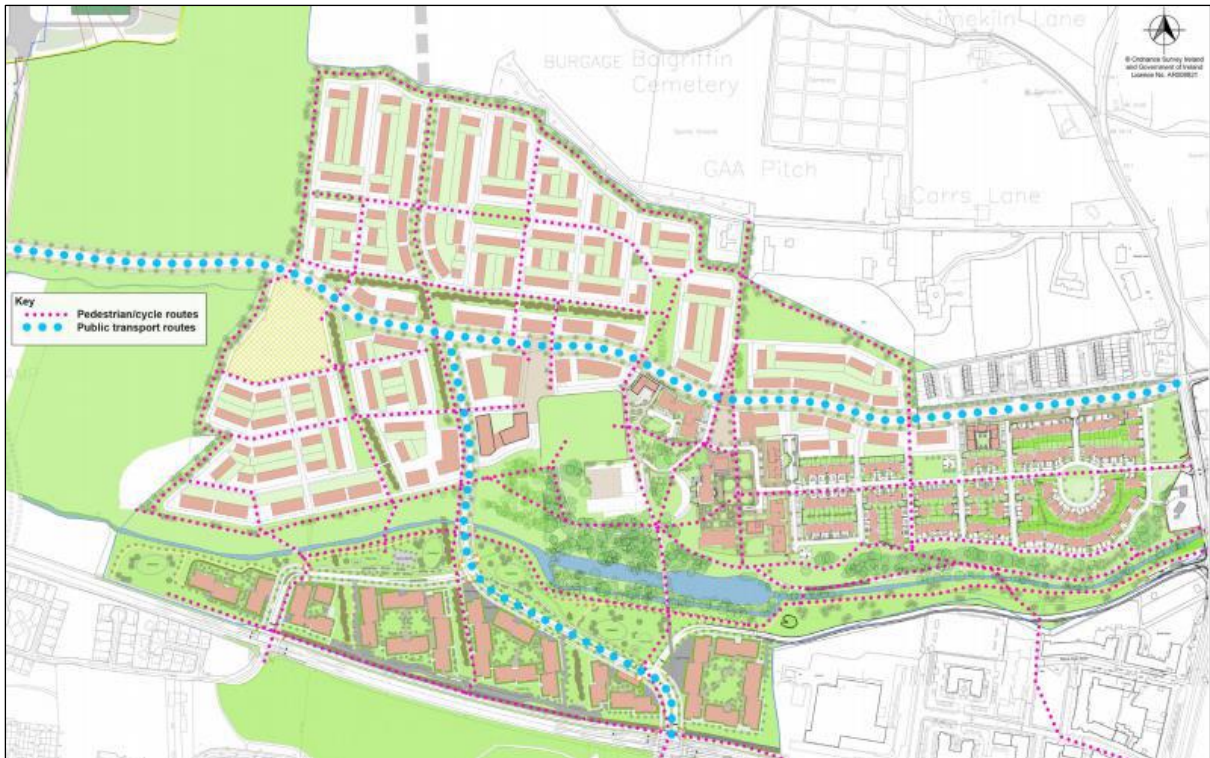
Overall Site Plan as submitted at Stage 2 Pre-Planning
